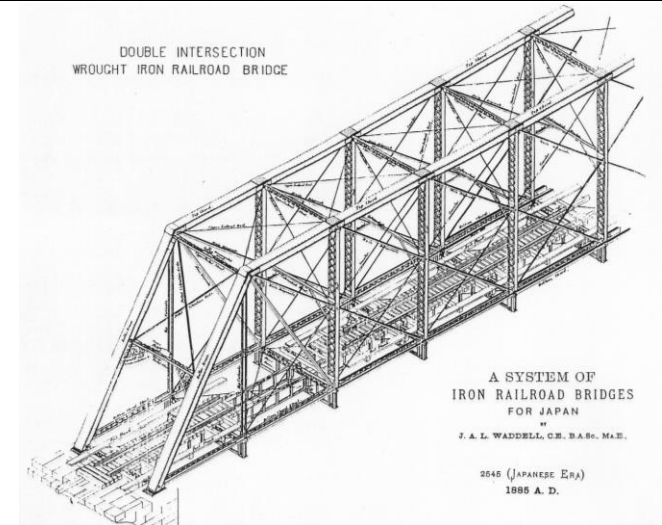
Isometric view of a truss railway bridge. Note the use of stiff connections at the front to eliminate the need for a brace crossing over this region. The open entryway stiffened at the corners is called a Portal Frame.
